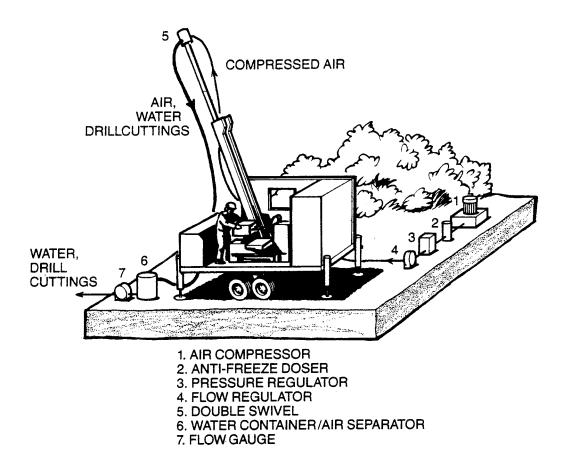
The surface equipment for core drilling using reverse flushing.
